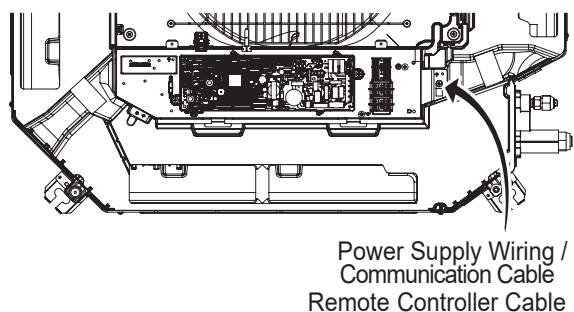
3' x 3' TA Frame Four-Way Cassette Wiring / Cable Routing, Side View.
